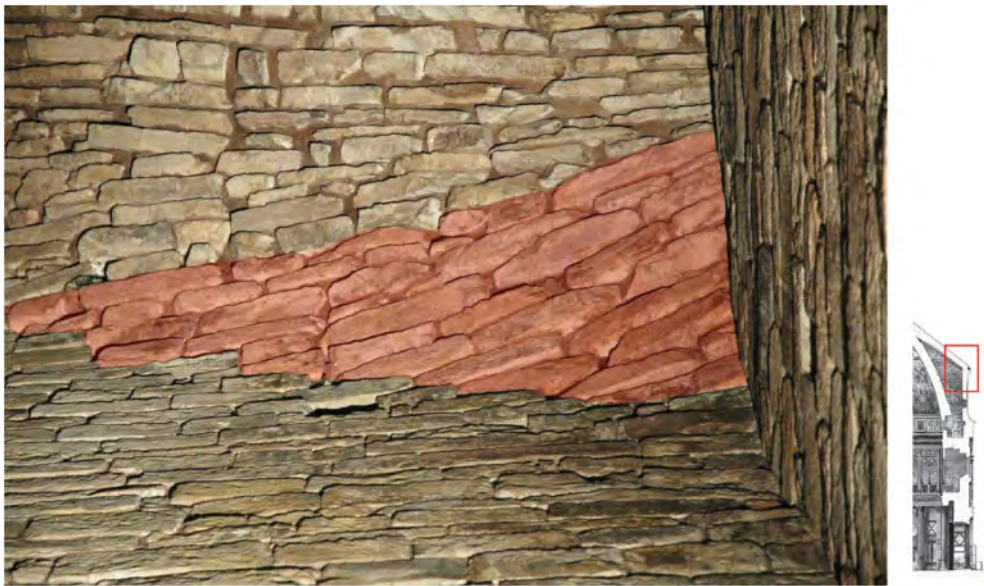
Garret of the Baptistery; detail of the top of the transversal partition wall with the skewed masonry (red) connecting to the edges of the lunette of the outer wall of the attic.
